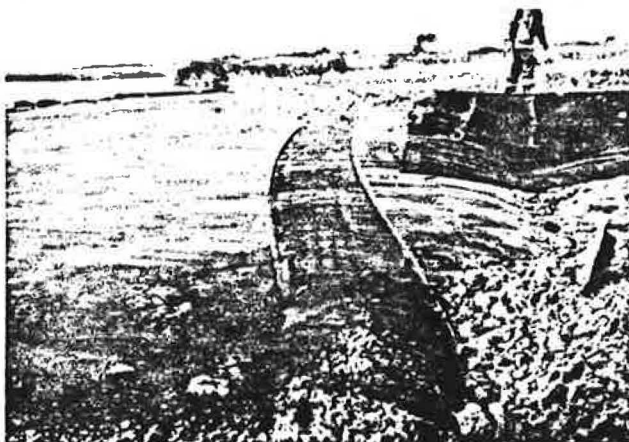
Gap caused by tensile failure of thread holding fabric strips together.
